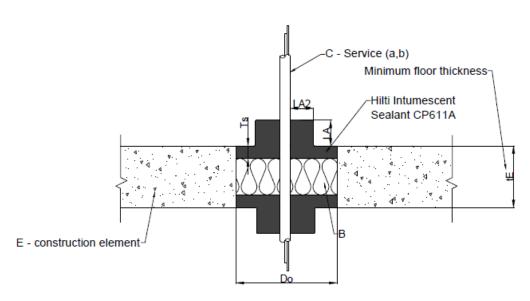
Side View, seal type 20, uPVC Conduits 16 ≤ Dia. ≤ 32mm, in concrete floors
